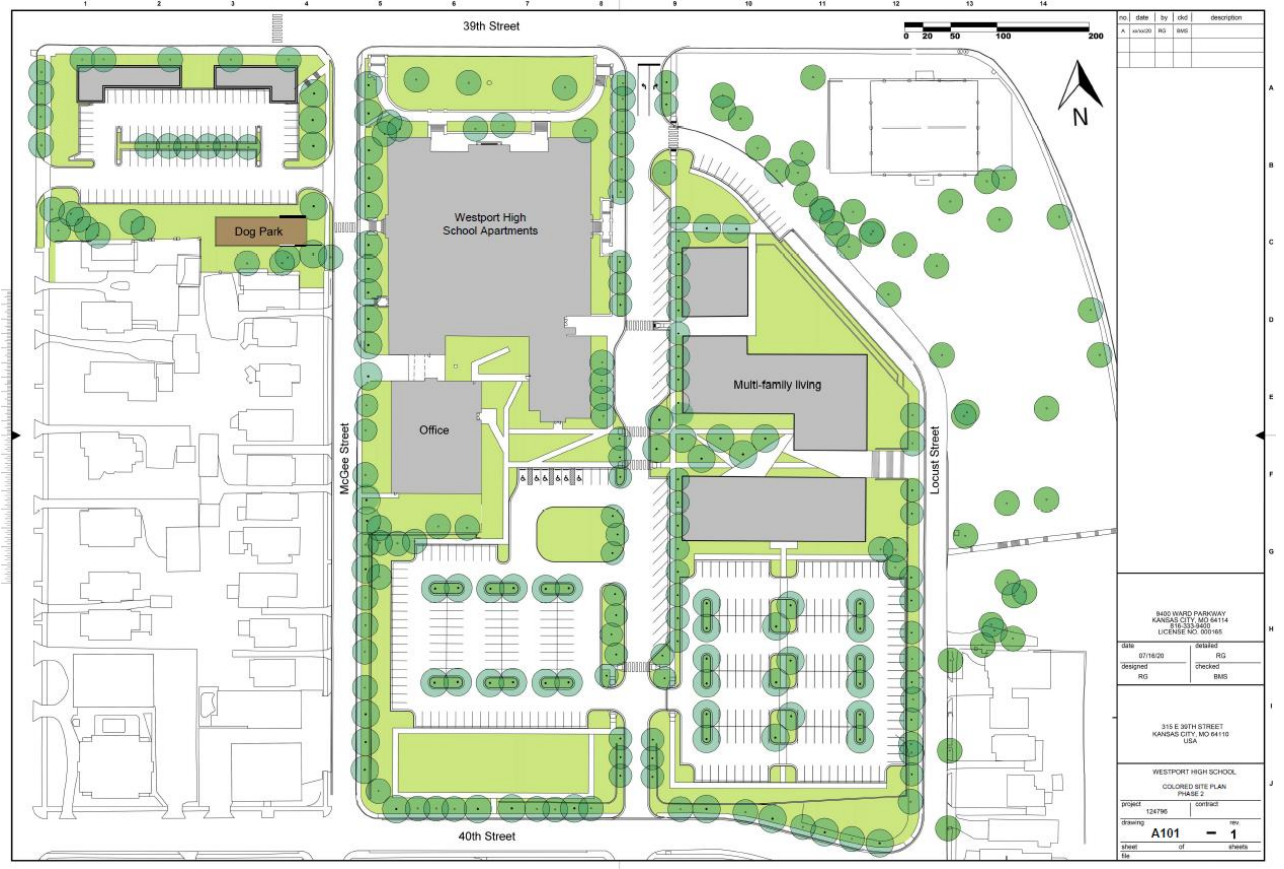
Proposed Redevelopment Site Plan- Phase II. Courtesy Burns & McDonnell.
